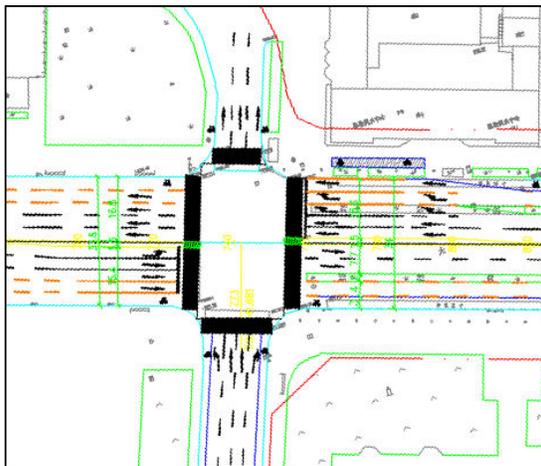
Intersection Channelization (Taihang Street and Yingxiong Road)
